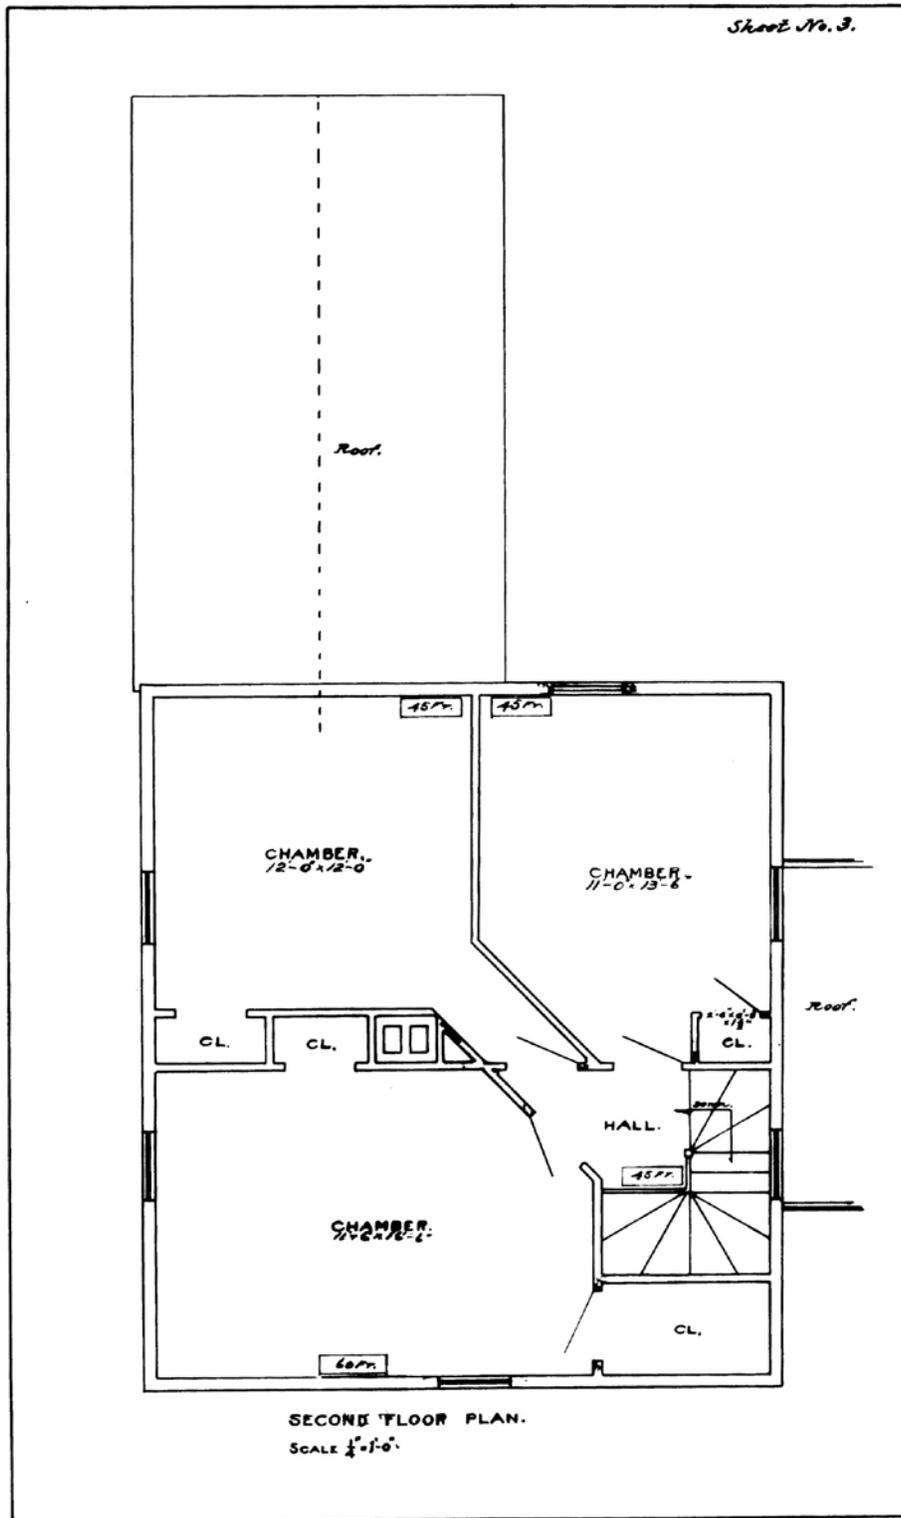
Second-floor plan of the Baker Island Light Station, showing proposed alteration to the dwelling, circa 1903 (Sheet 3 of 3); annotated in January 1920 with room dimensions and radiator locations.
